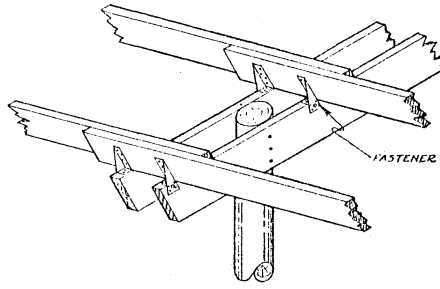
Fasteners shown above securely anchor roof purlins to rafters. Thus, full strength of the roof framing is utilized to prevent wind damage.
